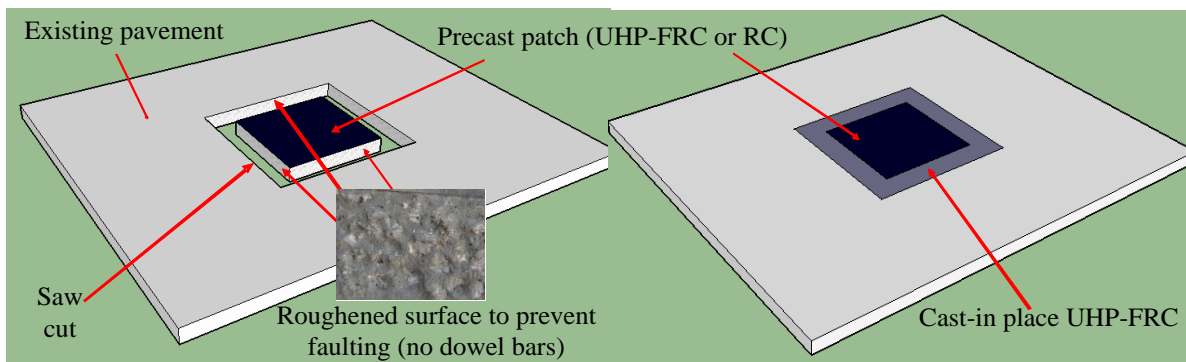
12 Proposed method for UHP-FRC pavement repair.
